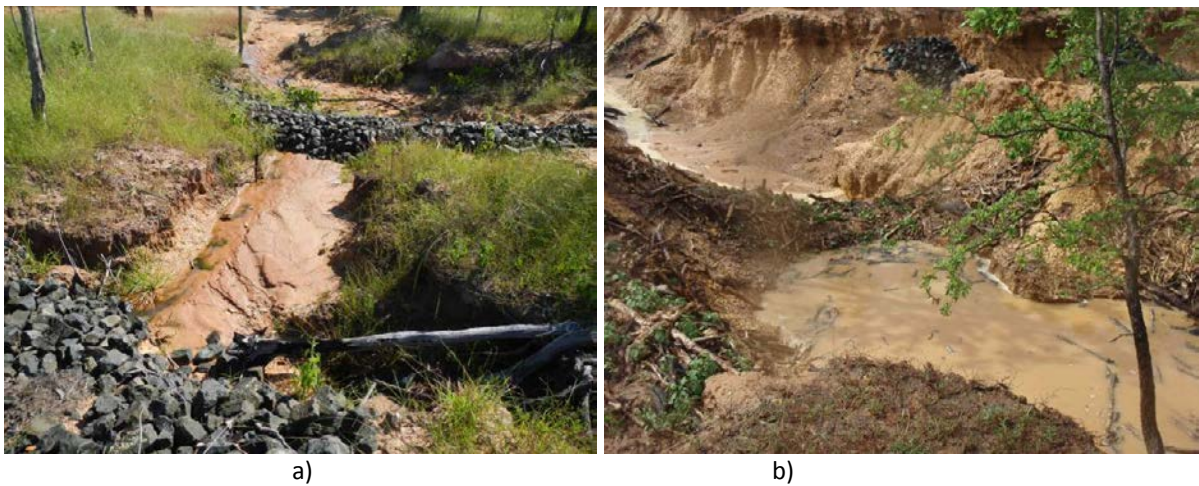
Examples of water and sediment trapping behind a) rock (CRGC58) and b) wood (CRGC1-33) grade control structures.
